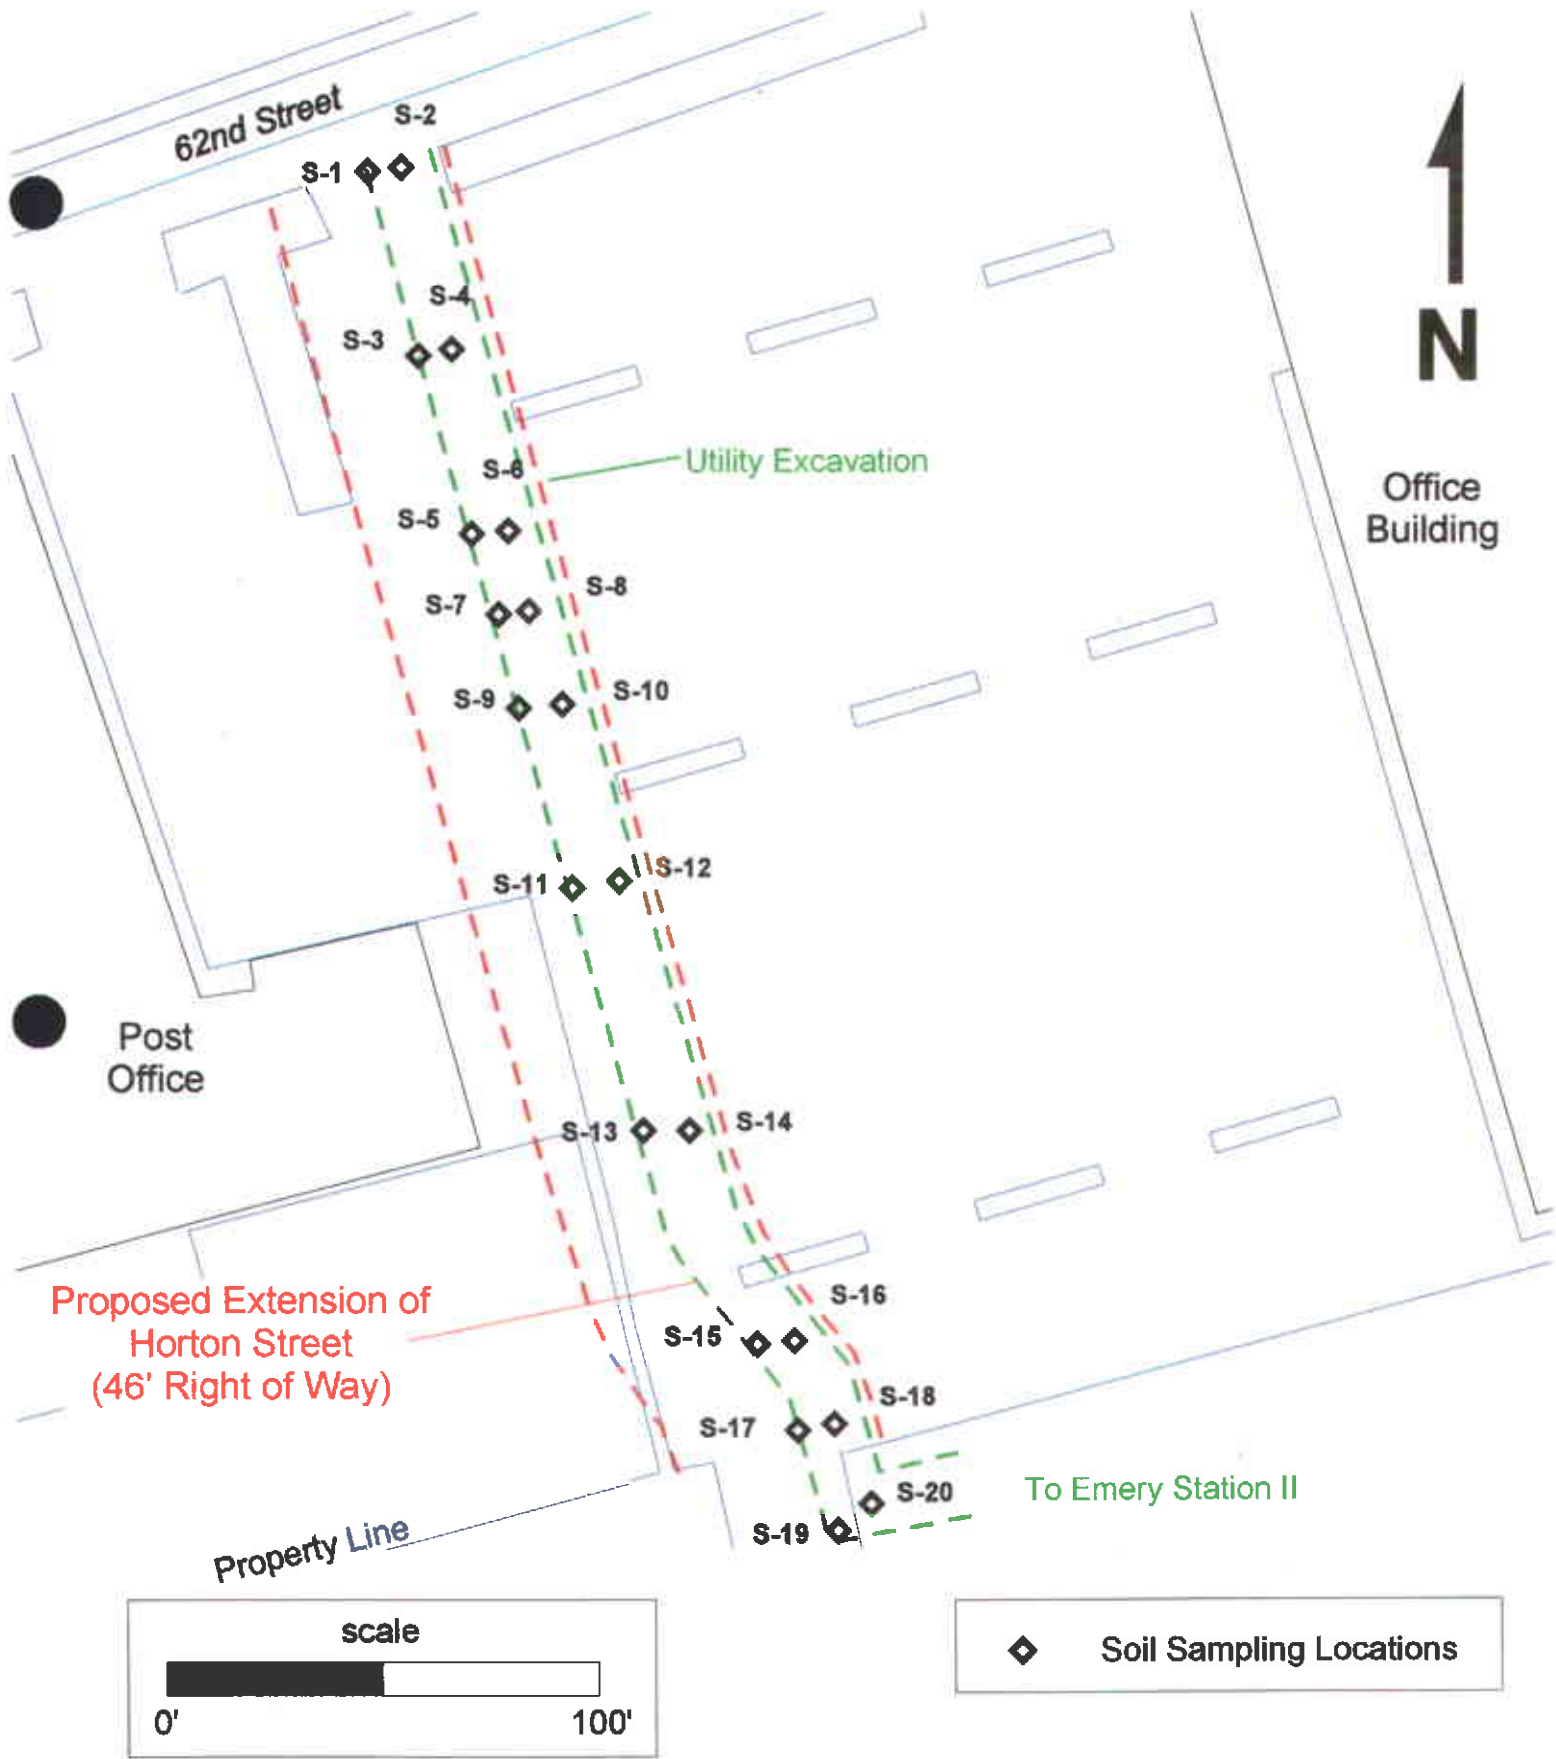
Location of Confirmatory Soil Samples Collected From the Sidewalls and Bottom of Sewer Trench
